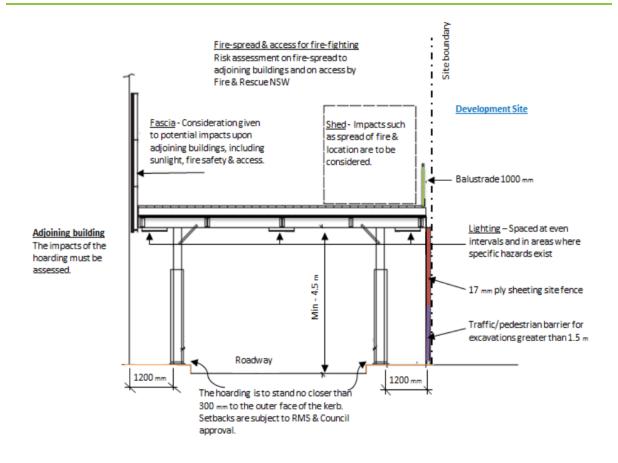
Type B Hoarding (minimum dimensions) spanning roadway
